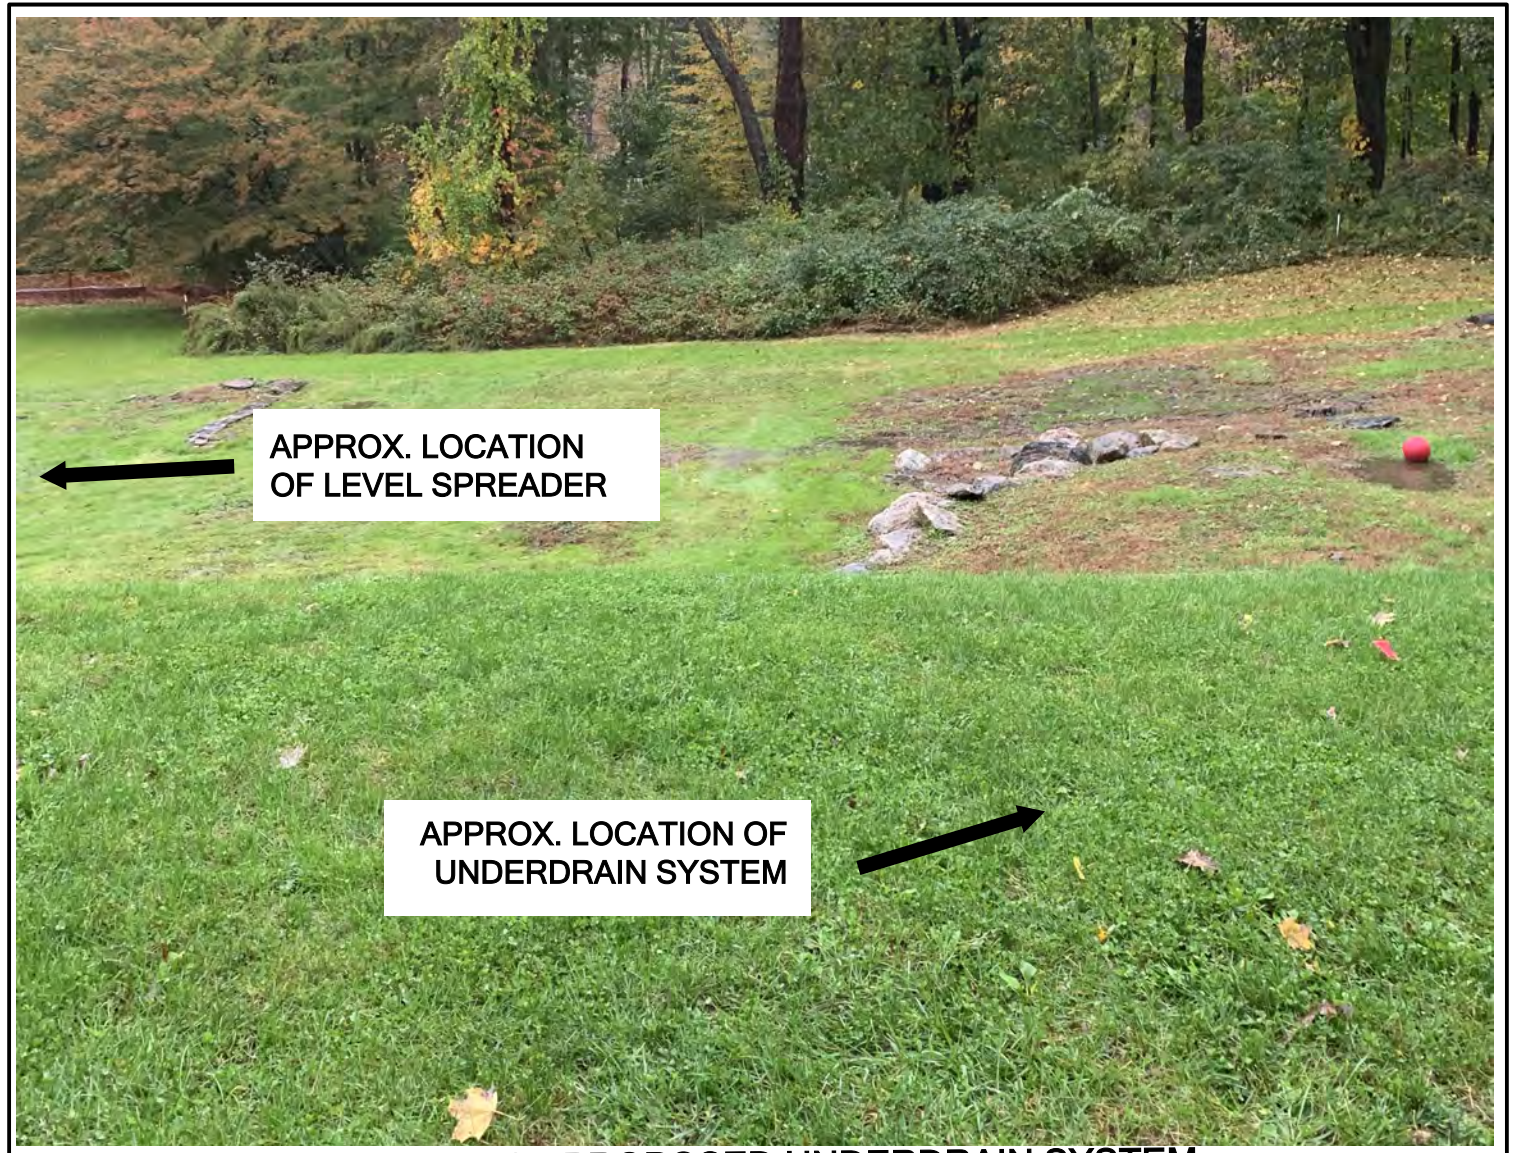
LOCATION OF PROPOSED UNDERDRAIN SYSTEM (VIEW LOOKING EAST. PERFORATED PIPE FOR UNDERDRAIN LOCATED IN WETLANDS BUFFER ONLY)
